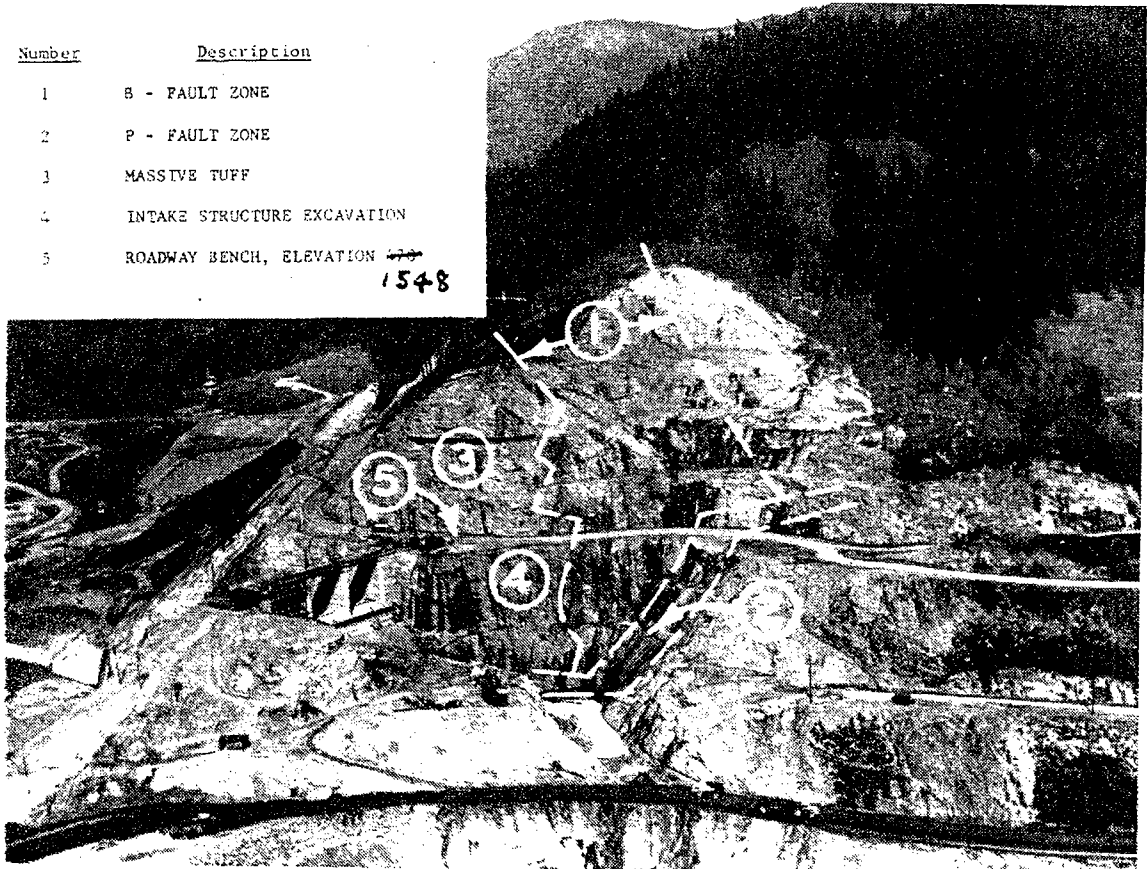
Completed excavation showing relationship of faults and cut slopes.
